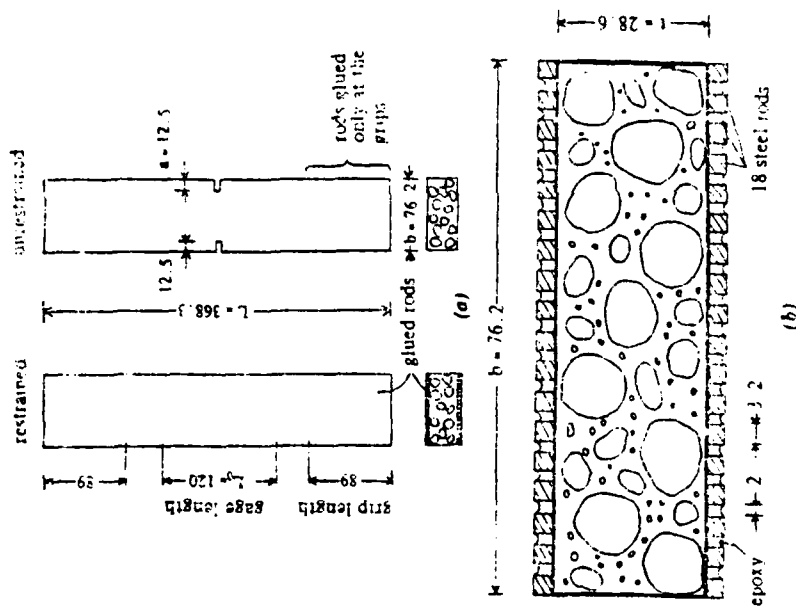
(a) Notched and Unnotched Specimen Tested; (b) Arrangement of Steel Bars at Surface of Concrete (All Dimensions in mm)
